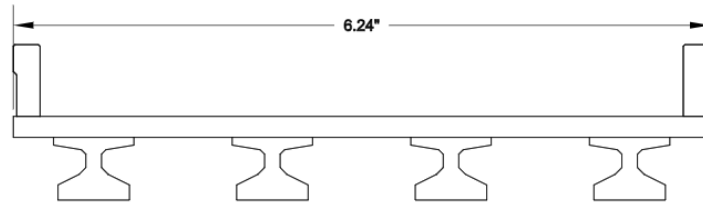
Bridge Model 1: 26' wide deck with four TX-28 girders
